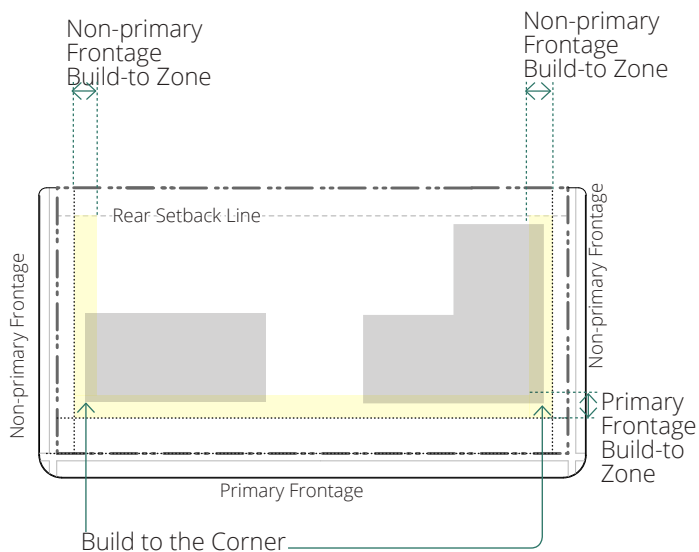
B-1. Build-to Corner and Build-to Zones
